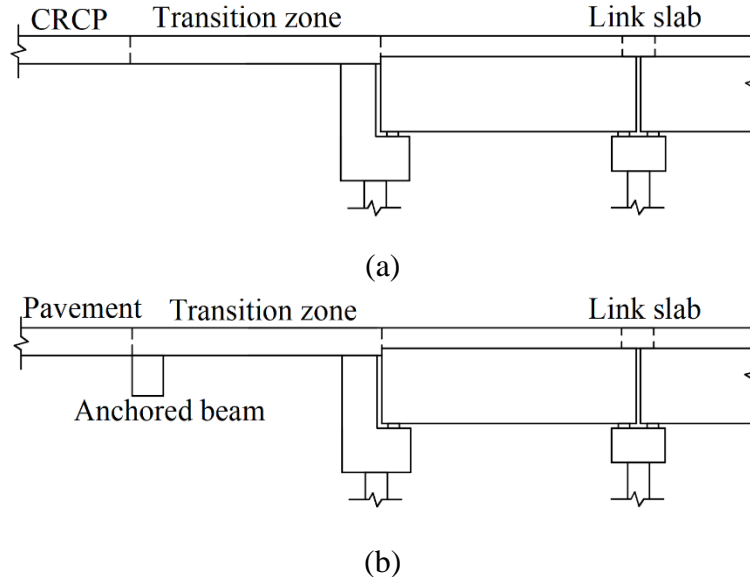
Two types of seamless bridge-pavement systems: (a) Seamless bridge-CRCP system; (b) Seamless bridge-pavement system with an anchor.
